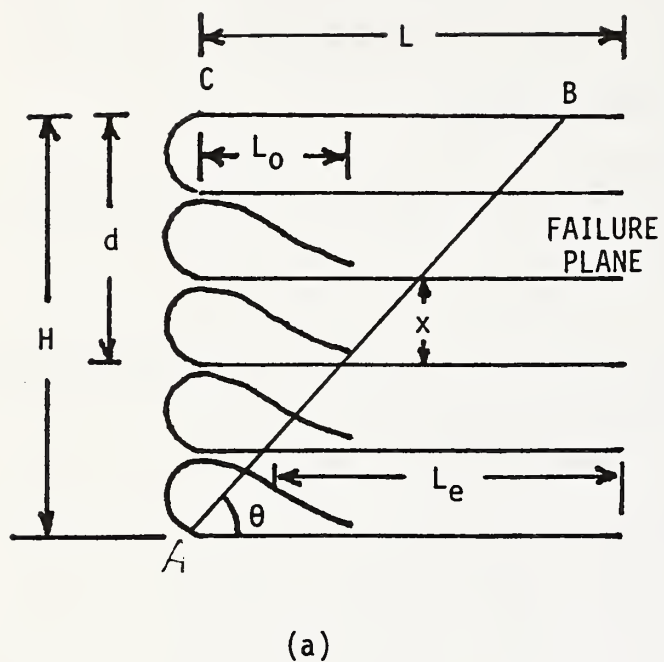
Sketch of section through fabric retained earth wall and assumed earth pressure distribution.
